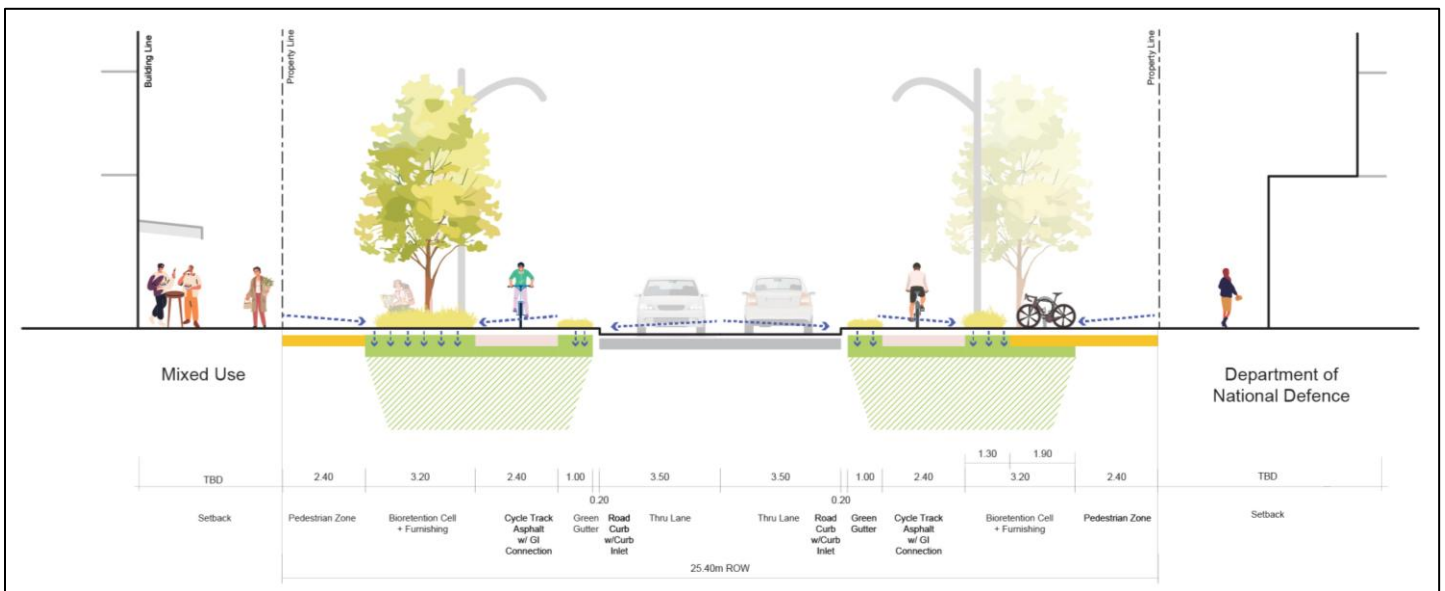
Northern Street (Billy Bishop Way to Sheppard Avenue West) Cross-Section – Option 4
